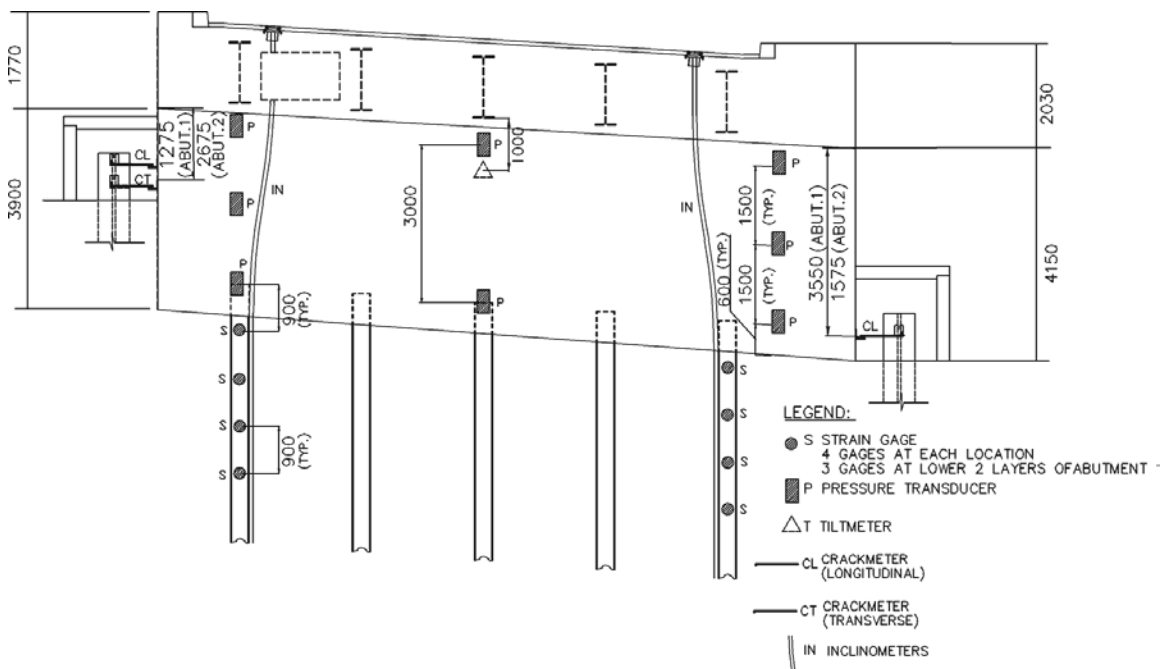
Abutment Instrumentation at Stockbridge Bridge
